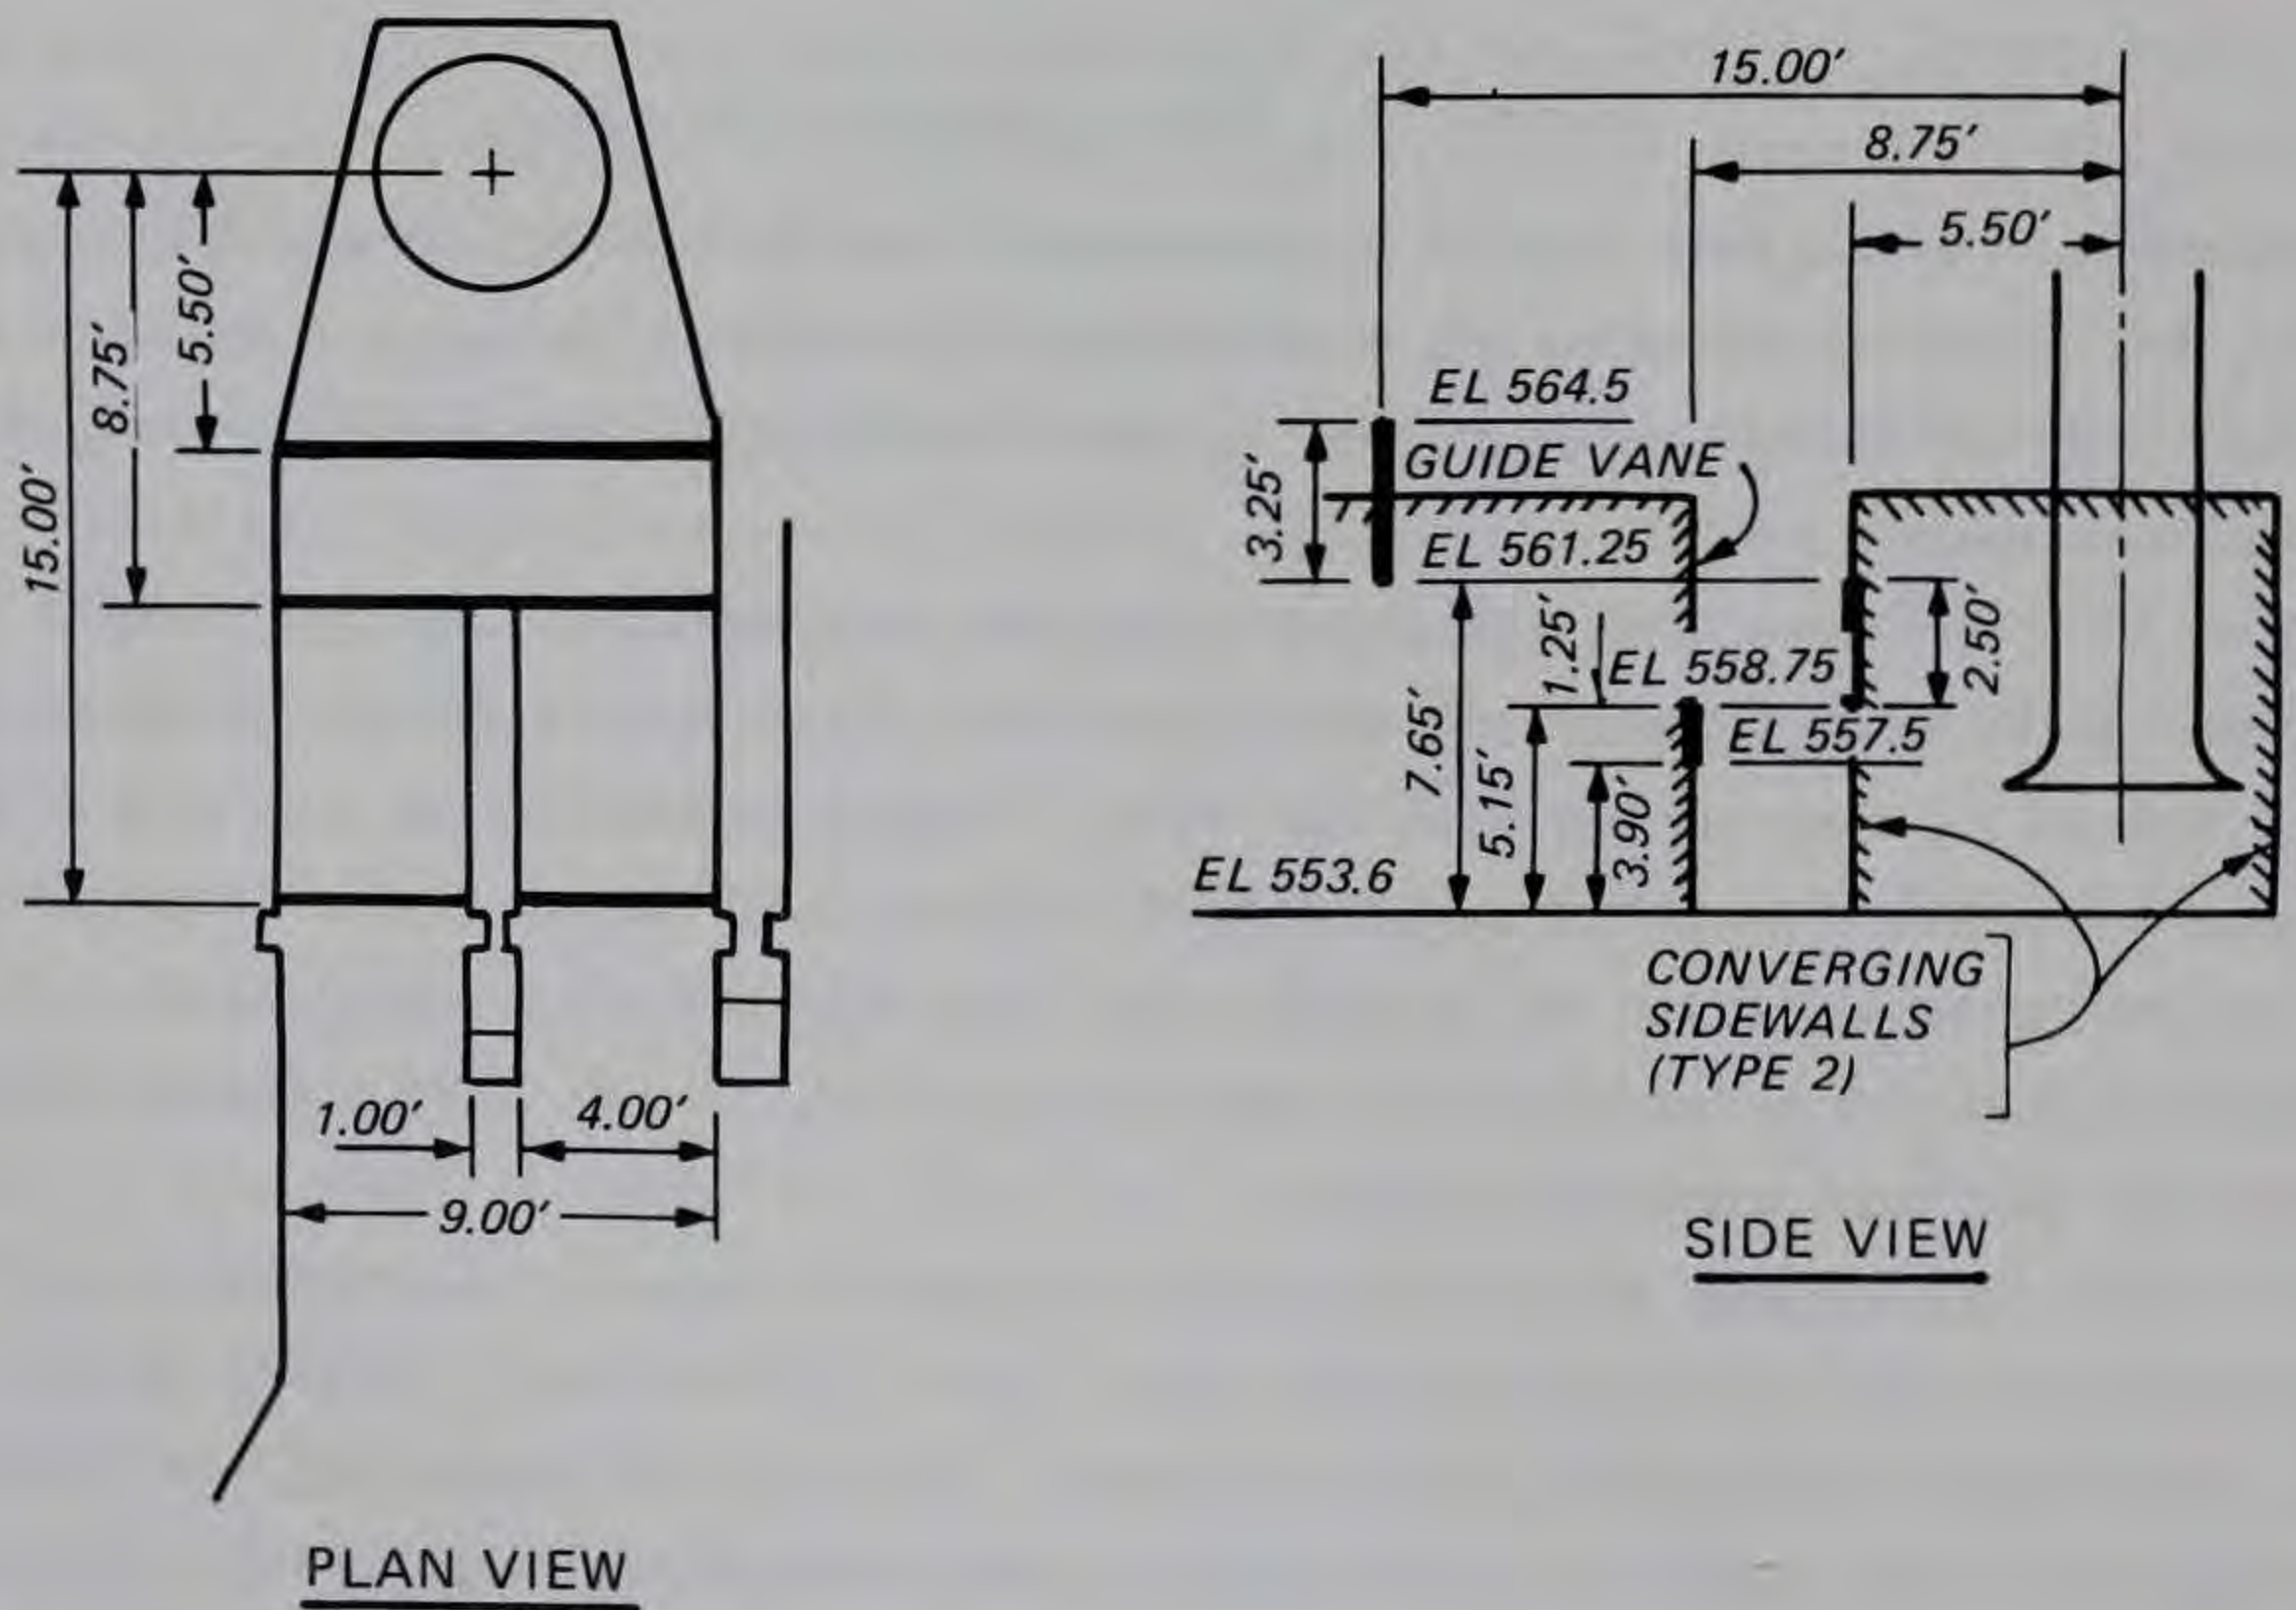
Type 1 design vortex suppressor beams with type 1 design guide vane and type 2 design sidewalls
